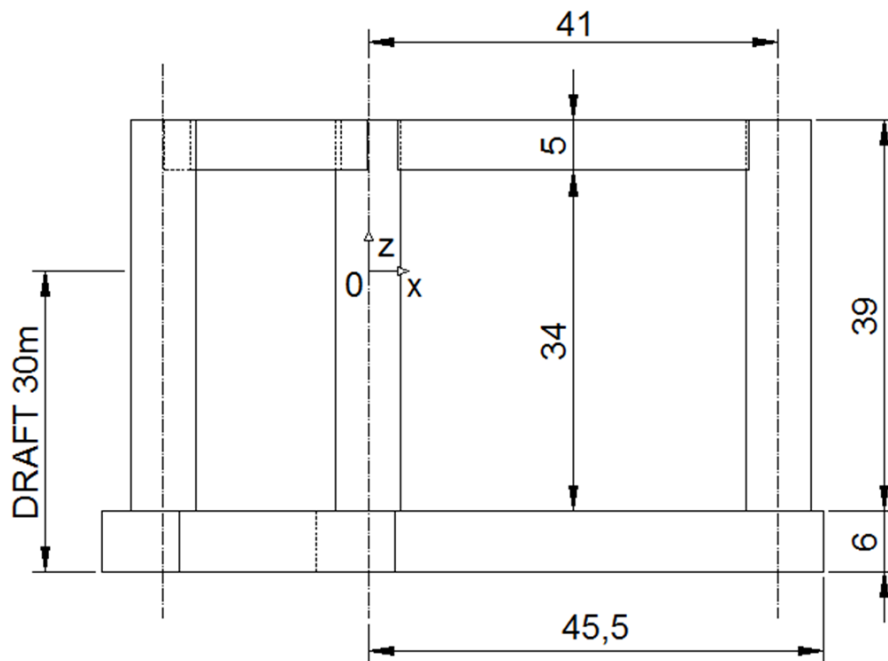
New CSC hull dimensions, side view, dimensions in meters [m]
